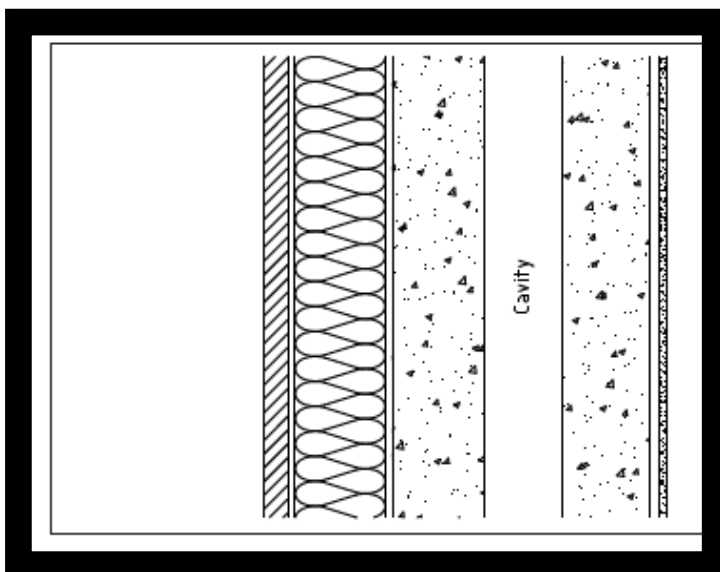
Masonry wall with cavity, external insulation (BS, 5250:2011+A1:2016)
